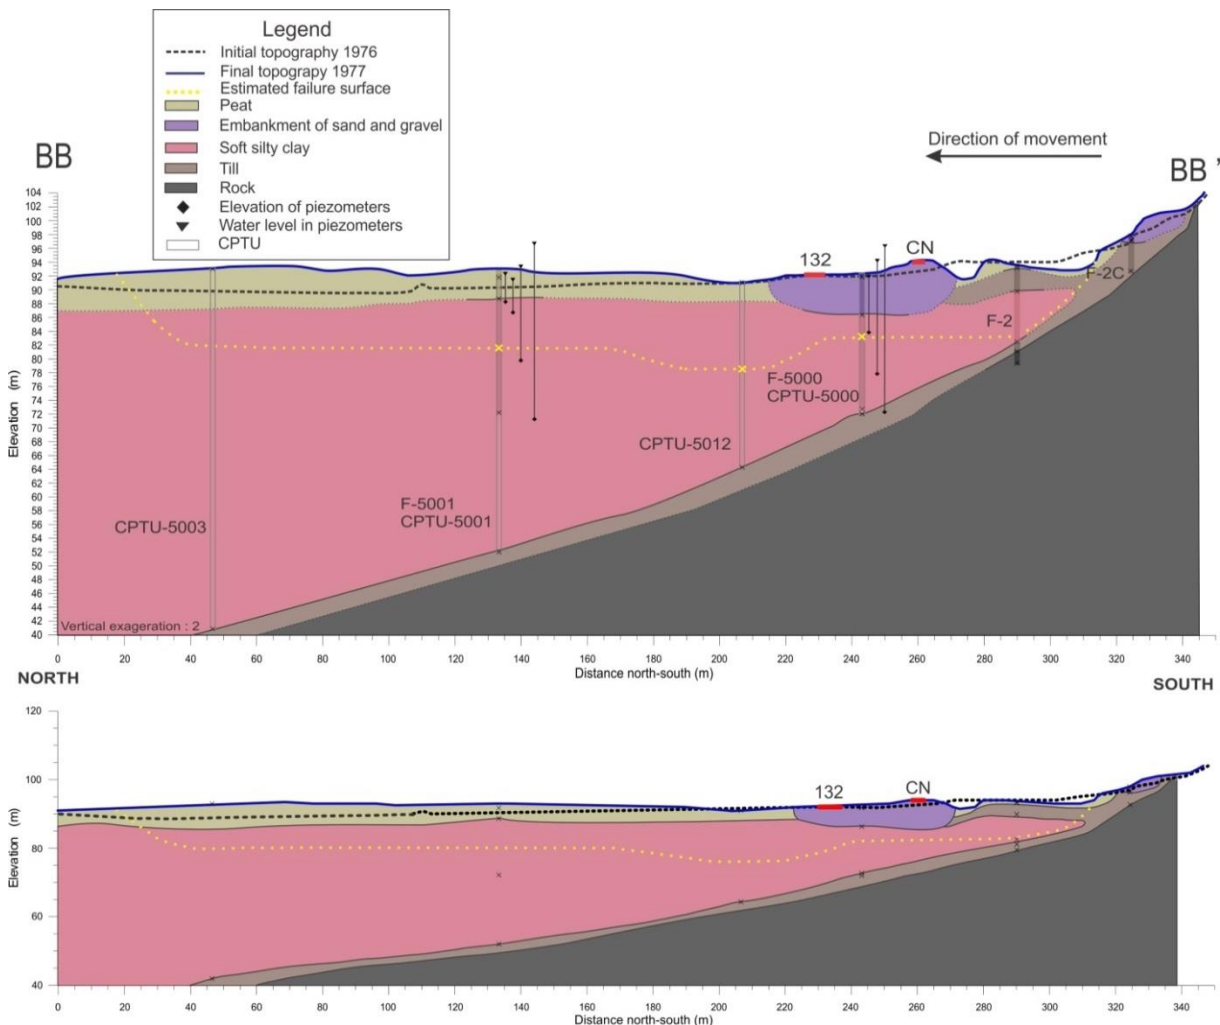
Cross section BB of the landslide showing topography before and after the event, stratigraphy and water level in the piezometers. The upper cross section is depicted with a 2X vertical exaggeration and the lower cross section is depicted with no vertical exaggeration.
